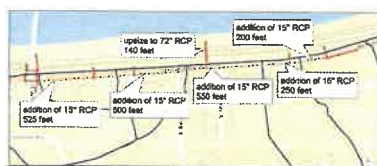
ARGE-1 Proposed Stormwater Network Upgrading for 5-Year Event, West Section.
